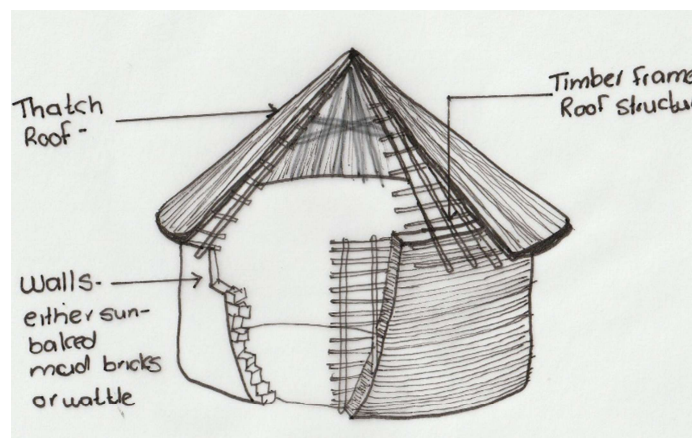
Sketch of a typical hut structure indicating two wall configurations, sun-baked mud bricks and wattle walls
